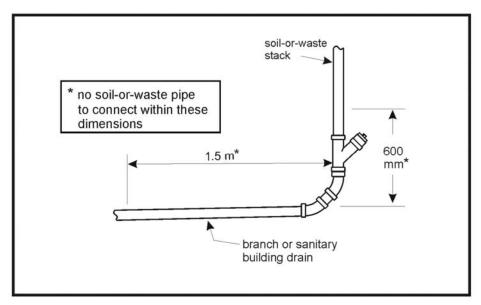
(4) Soil-or-Waste Pipe Connections
